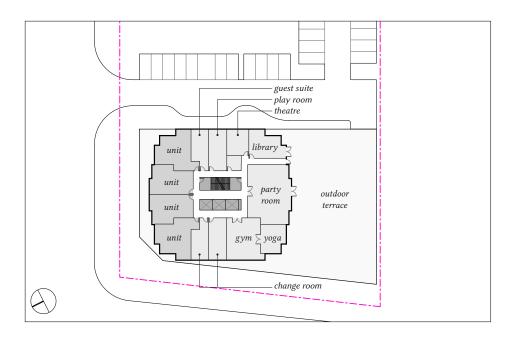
Condominium Project Podium Plan: Roof, Amenity Floor—this figure illustrates the schematic layout of the condominium project's podium roof level (the third floor), as developed prior to the global pandemic. The plan features both indoor and outdoor amenity areas for the building residents. (source: figure by author; adapted from a project by Kirkor Architects and Planners, n.d.)
